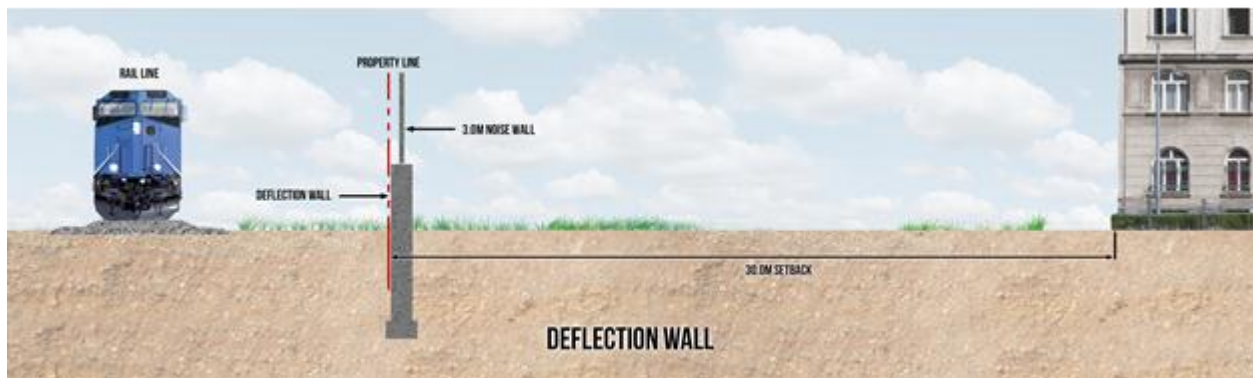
Deflection Wall (or Crash Wall) Plus 30 m Building Setback
